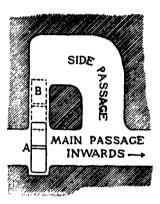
Diagrammatic Plan of Stone Door in an underground gallery in Cappadocia.
